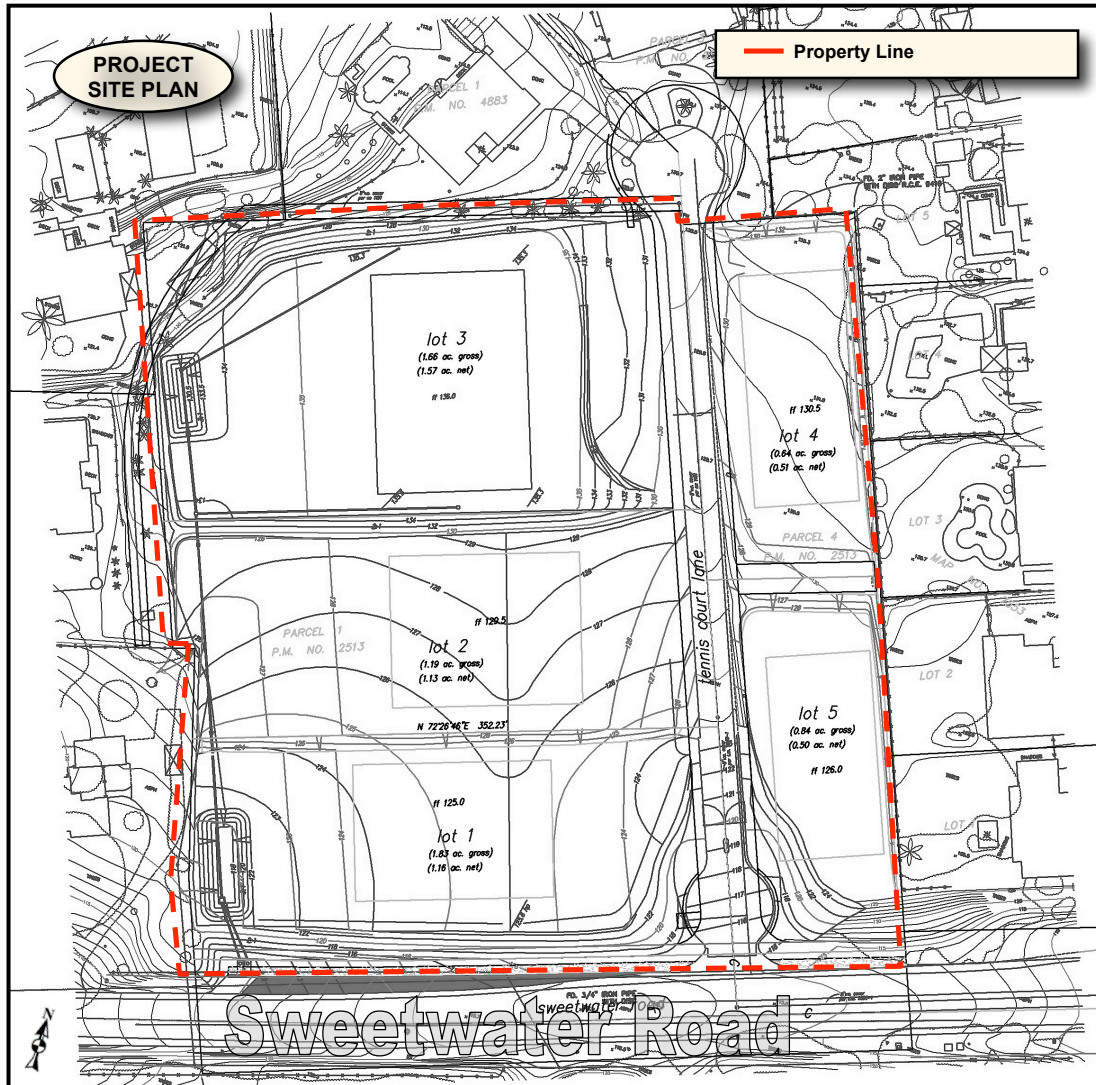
Proposed Site Plan – Las Mansiones de Bonita (Stuart Engineering 5/07)
